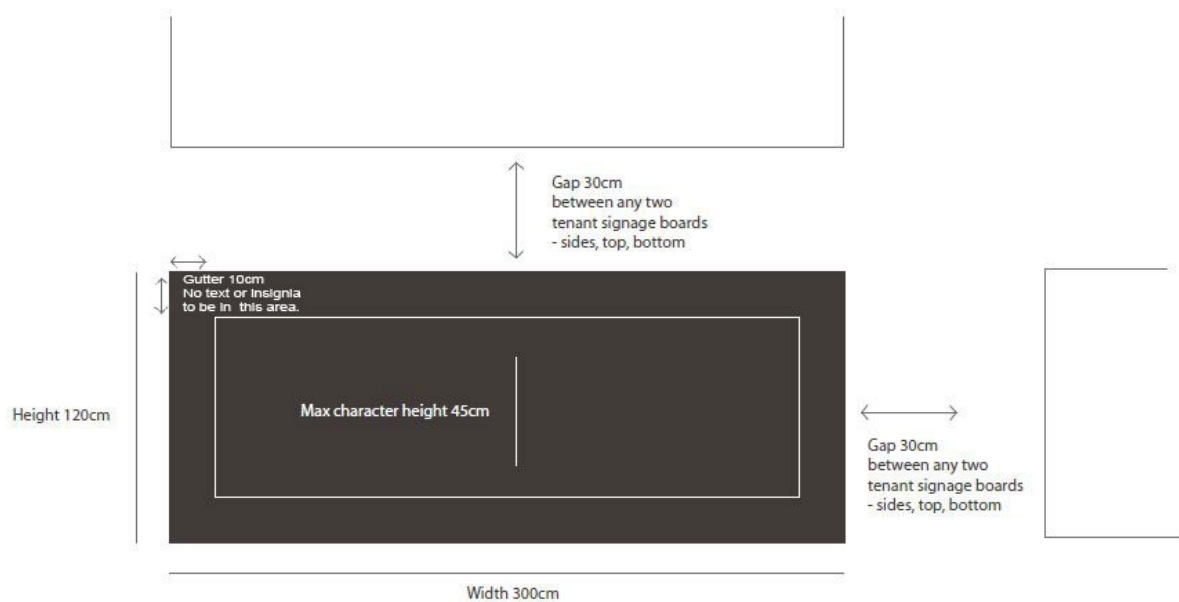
Tenant Board layout – Indicating Sizes, Dimensions and Layout.
